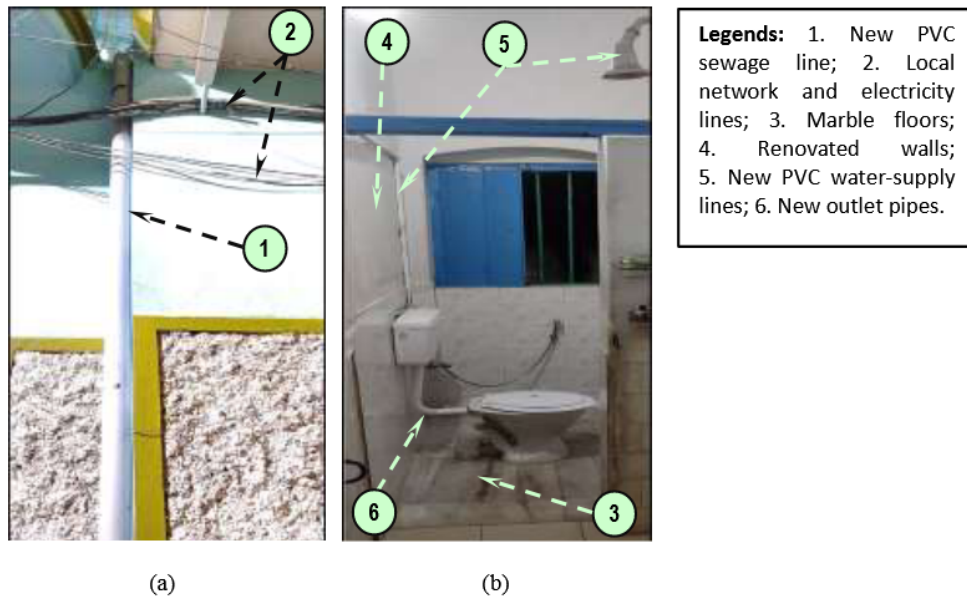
(a) Replacement of sewage pipes, and (b) Renovation of bathrooms and toilets
